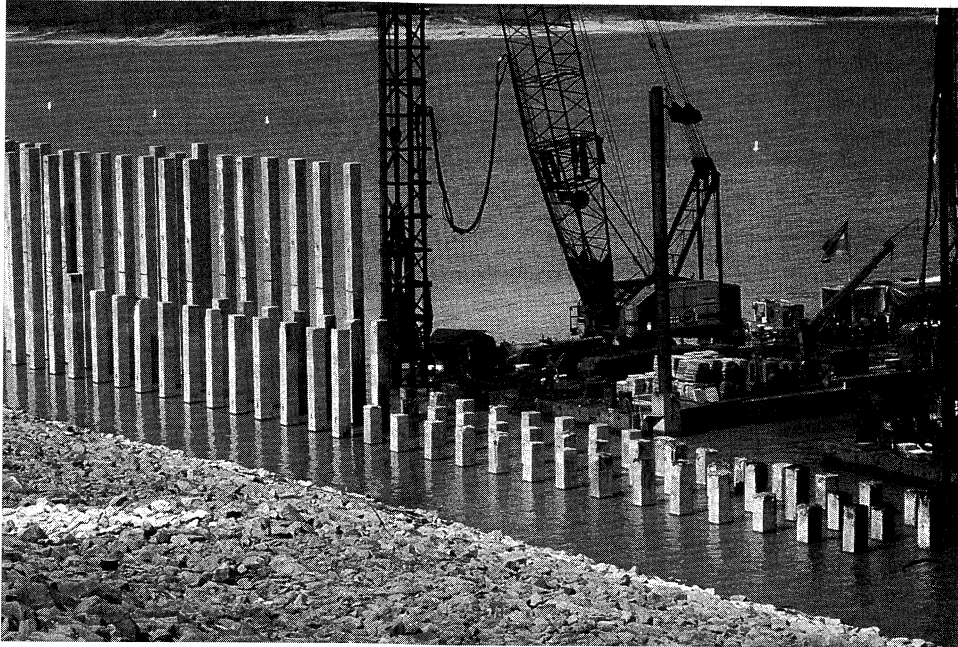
Compaction piles driven into the upstream embankment of Sardis Dam to reduce liquefaction hazards. The contractor drove the piles to this level with a barge-mounted conventional hammer; the piles were later driven below the water surface with a different hammer. (Photo by T. D. Stark; used with permission.)
